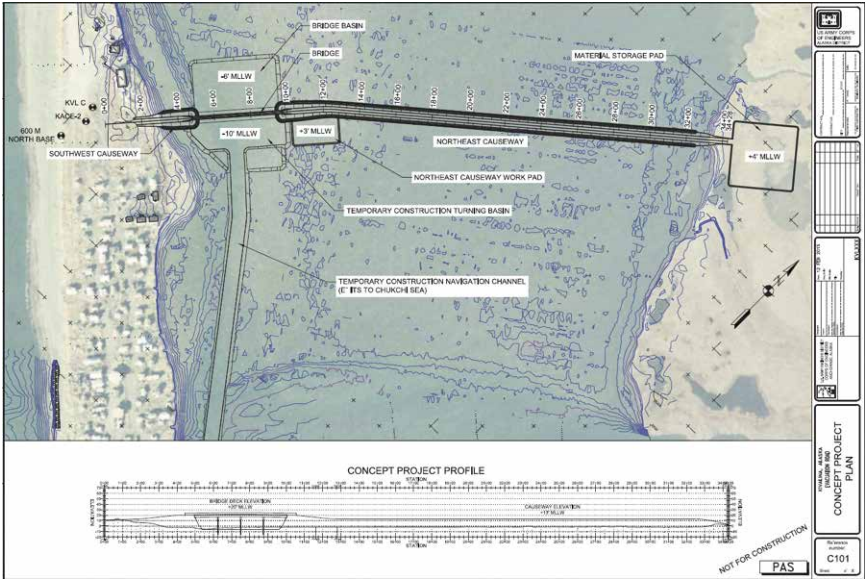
Recent concept plan and profile view of Kivalina Lagoon-crossing causeway and bridge design, Kivalina, AK.
